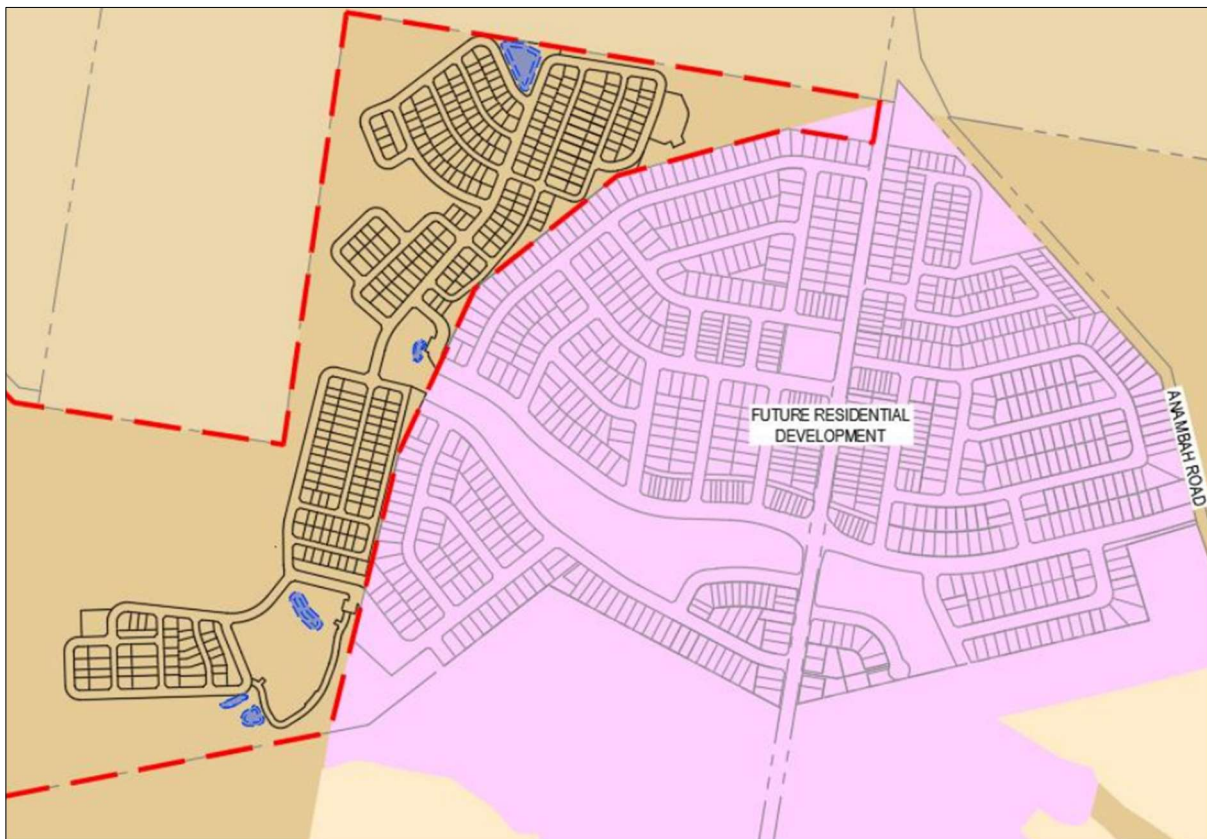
MHE Site (Outlined in Red) and Neighbouring Proposed Residential Subdivision. Source: MakerEng (2024)
